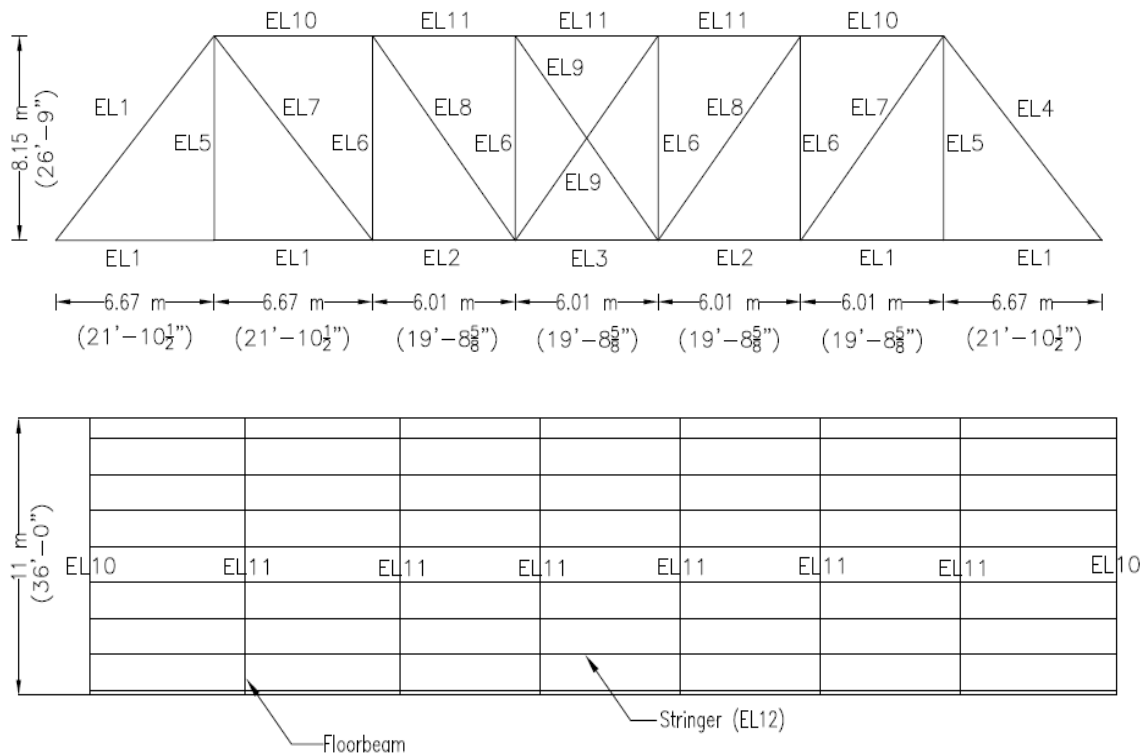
Typical Truss Elevation and Framing Plan, Beech Creek Veterans Memorial Bridge
